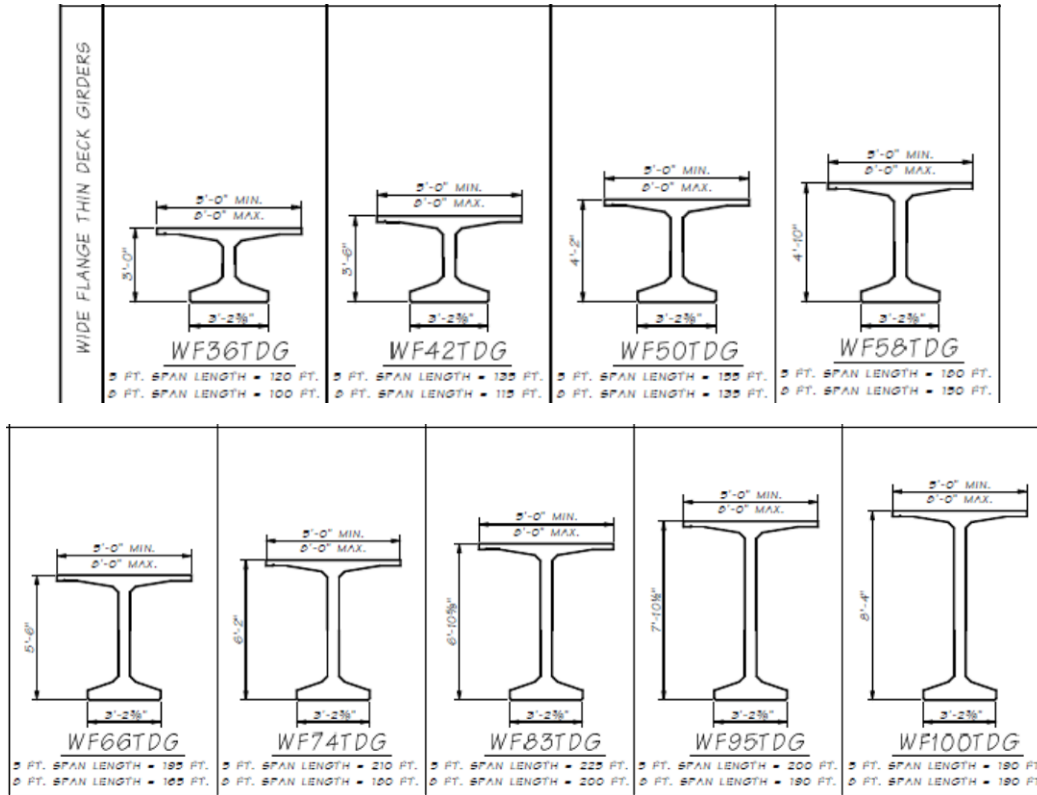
WFxxTDG Wide Flange Thin Deck Girders requiring 5" Minimum Cast-In-Place Concrete Deck.
